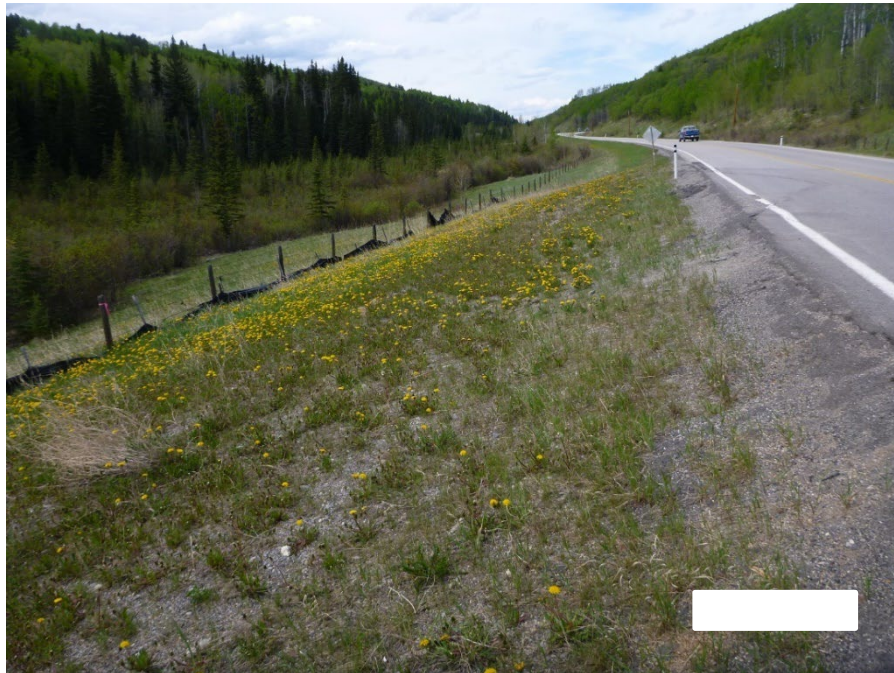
The west (southbound) highway embankment slope is well vegetated. Photo taken May 26, 2025, facing south.
